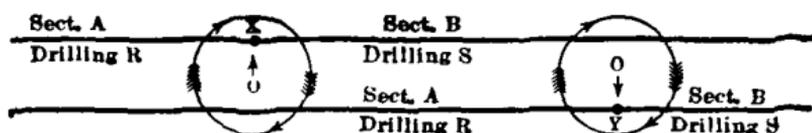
Am. El. Ry. Eng. Assn. uniform method for designating compromise joints.
